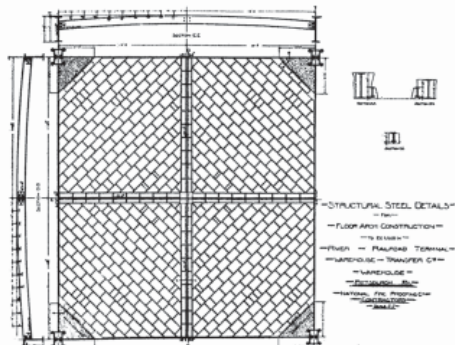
PLAN AND SECTION OF ONE FLOOR PANEL, SHOWING CONSTRUCTION OF THE PITTSBURGH TERMINAL WAREHOUSE, PITTSBURGH, PA.
